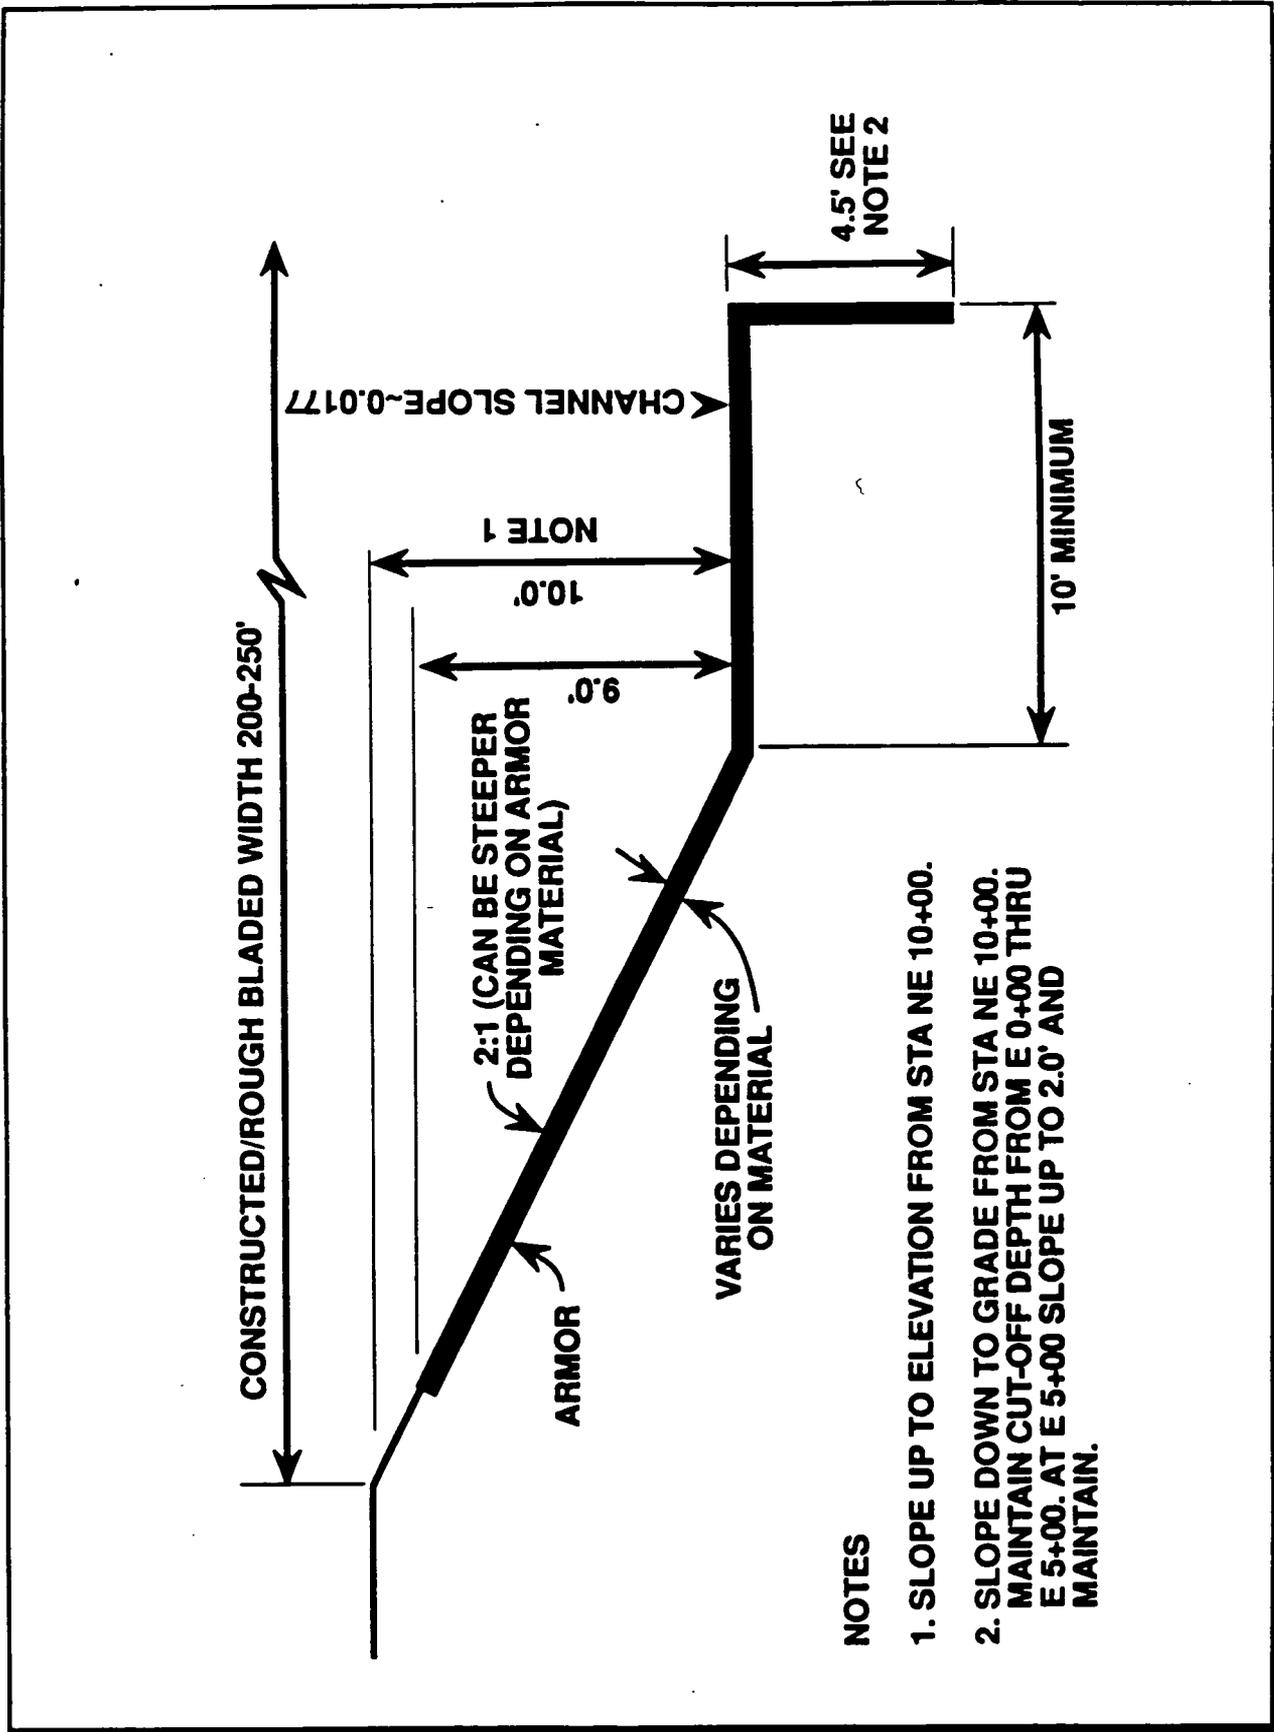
Typical Cross-Section for the East Flood Protection Dike and Storm Channel.
